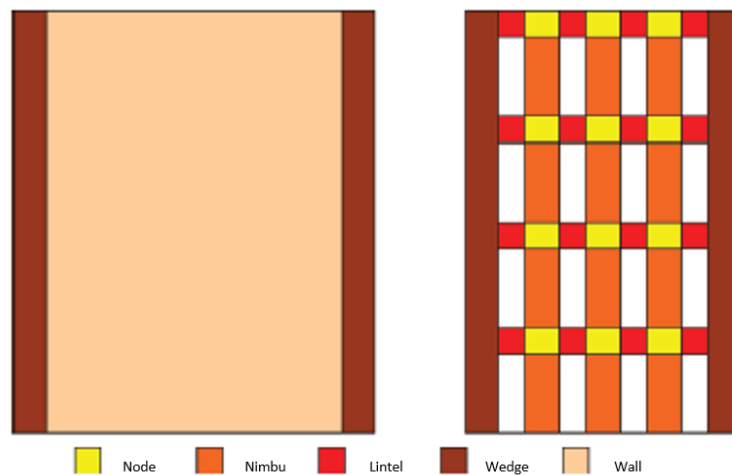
Example of zones to consider in walls for masonry building. On the left, party walls and on the right main façade. Adapted from (Candeias et al., 2020b)
